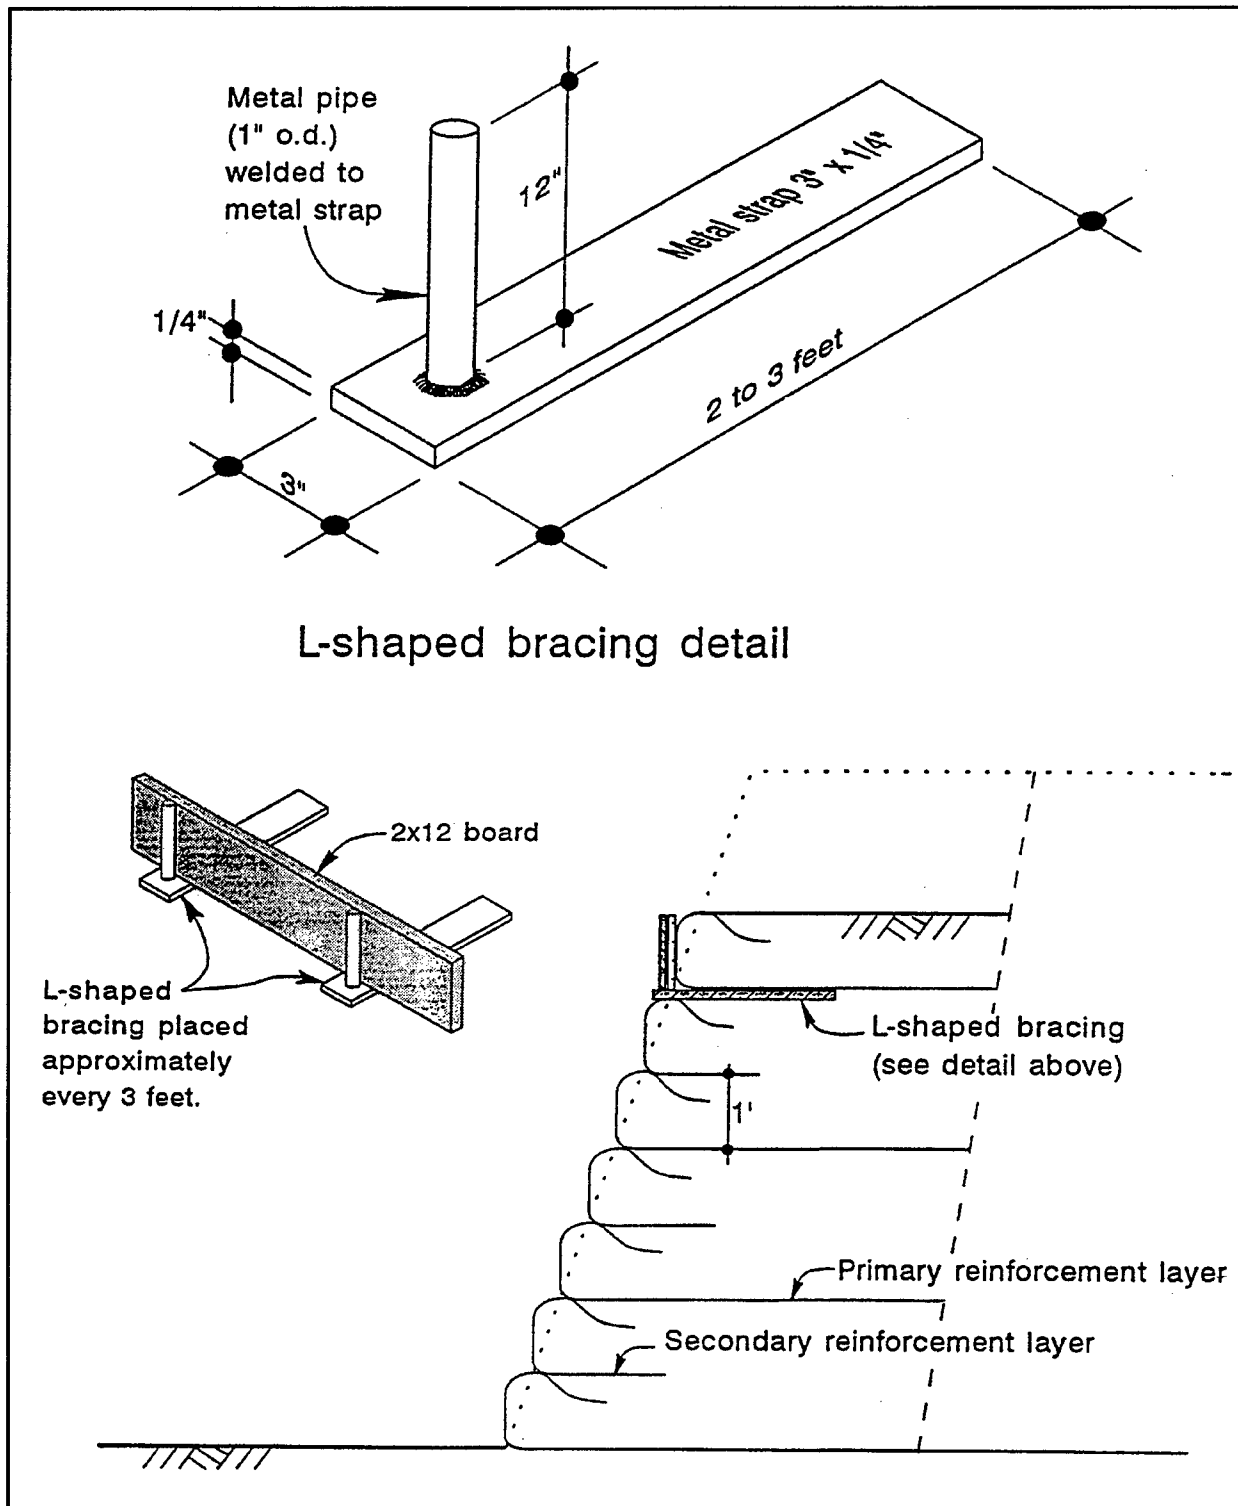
Removable face support used in construction of steep reinforced soil slope (from Leshchinsky 1997b)
